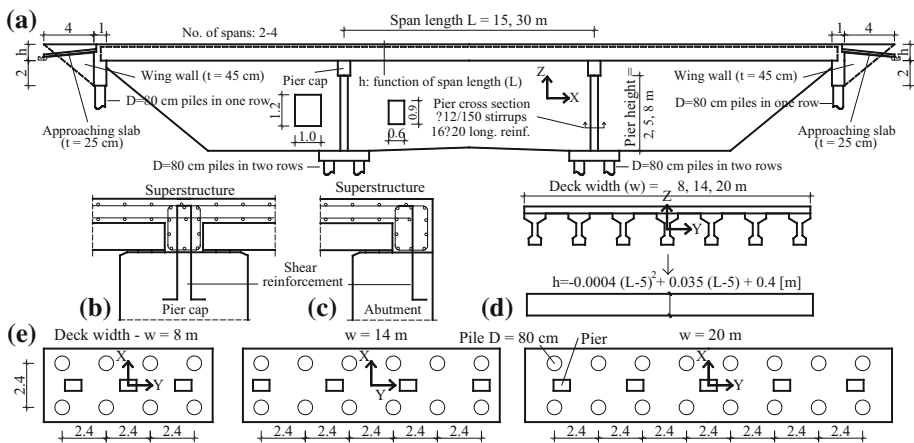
General layout of PMG bridges: a side-view of the bridge; b monolithic joint at the pier; and c at the abutment; d typical cross-section; e applied pile foundation arrangements for different bridge widths
